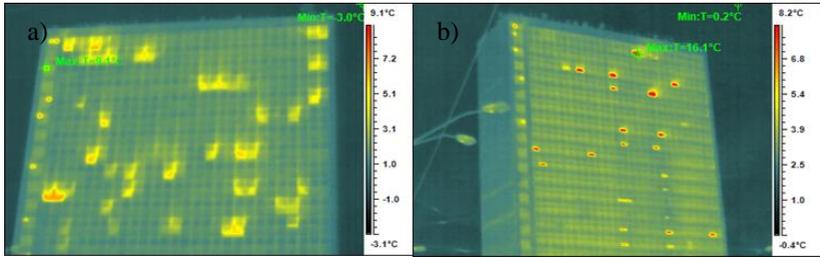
a) Simple facade with triple glazing, facing North-West, b) Double skin facade, facing South-East. Photo: Michal Lukačovič
